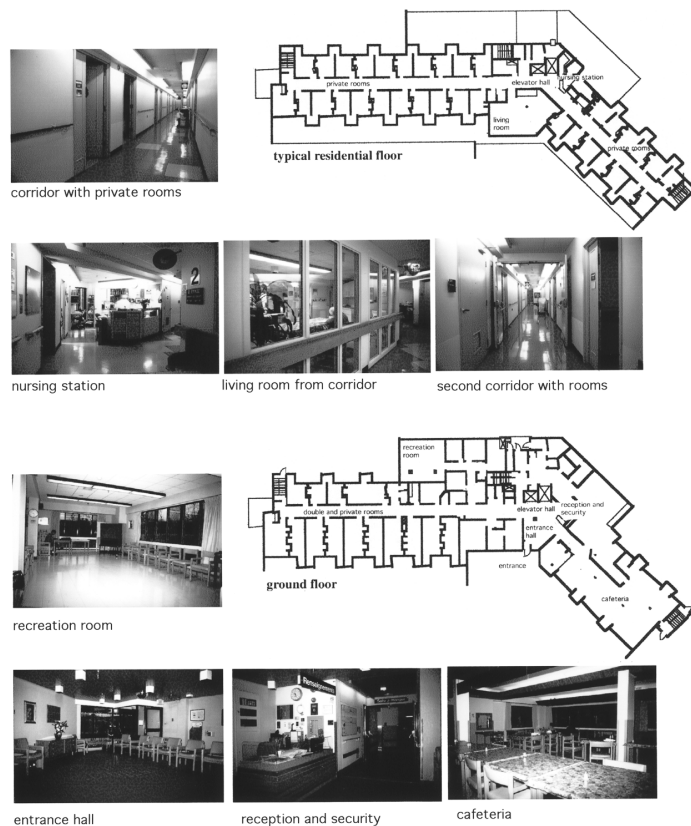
Typical Residential Floor Plan and Layout of the Ground Floor
